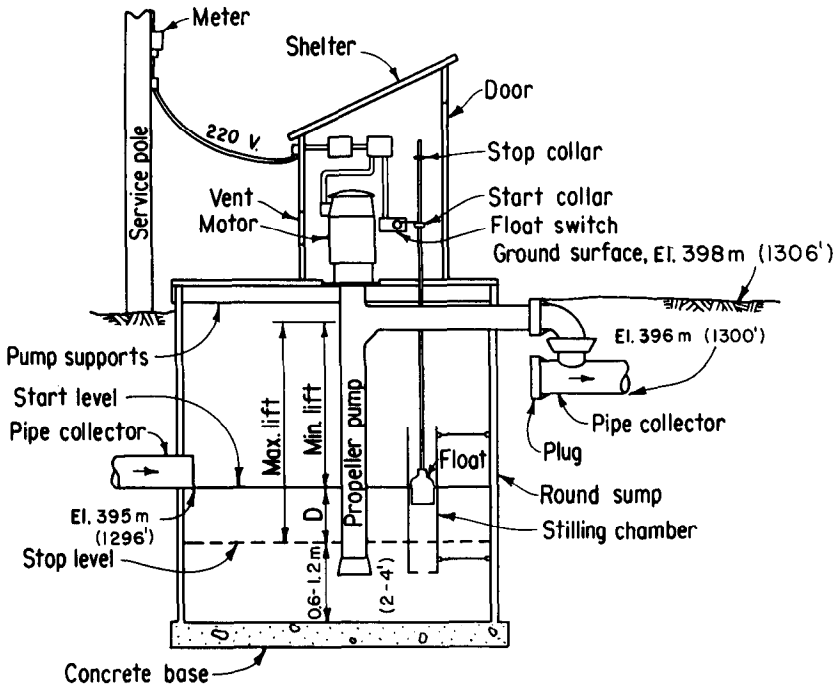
Typical arrangement of an automatic drainage relief pumping plant. Drawing 103-D-1673.
